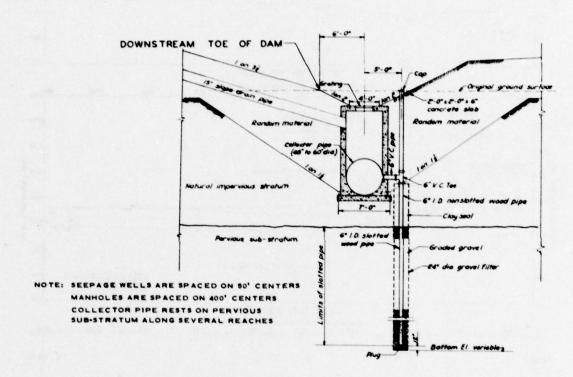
Typical section of downstream toe drain at manhole showing collector pipe (from Reference 3)
